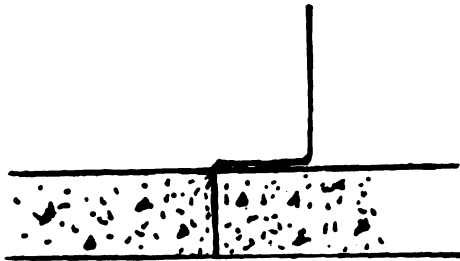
Depth gauge made from bent reinforcement rod to check depth of concrete.
